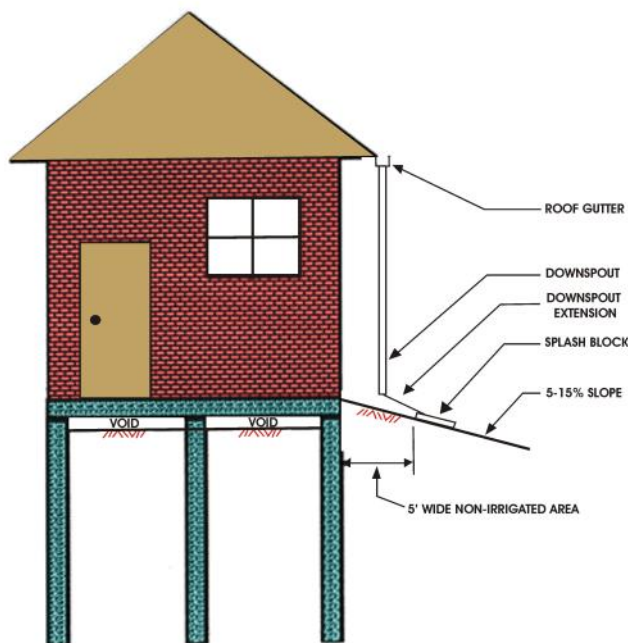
Foundation built on piers with a void space between the ground and floor. To keep the foundation well drained, a grade of 5 to 15% is built around the foundation perimeter, and gutters extend five feet from the building to provide a five-foot wide non-irrigated area. Image 1958, modified from Tommy Dunlap's slide presentation.
